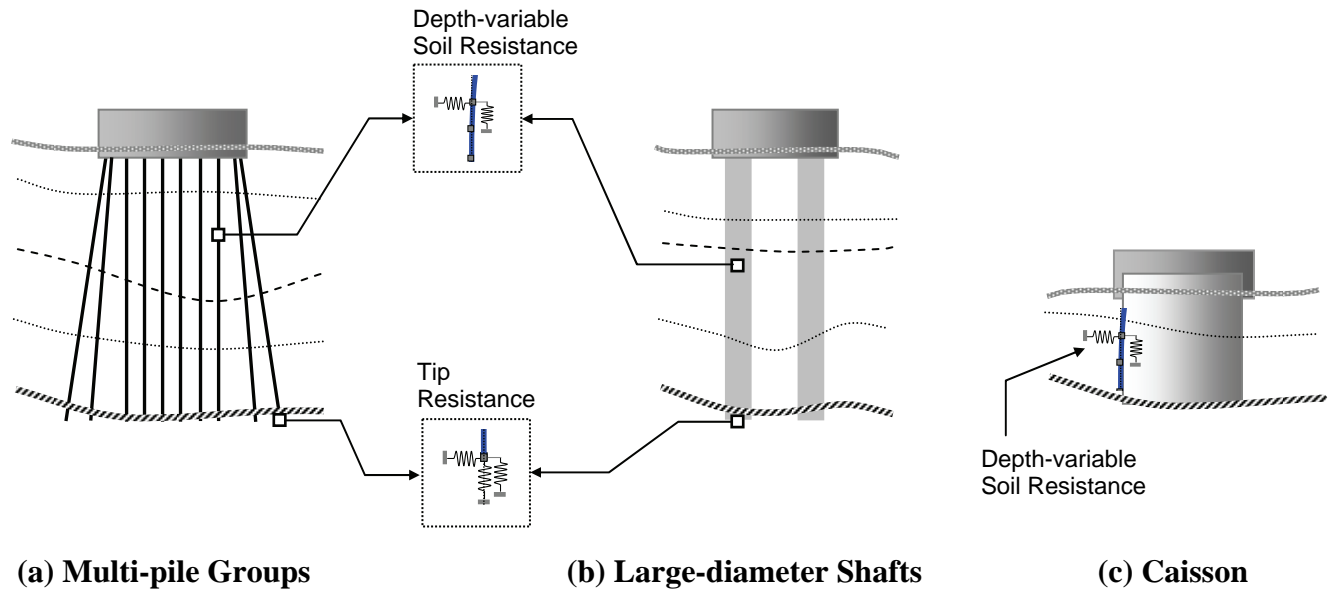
Typical Foundation Types for SC Truss Bridges
